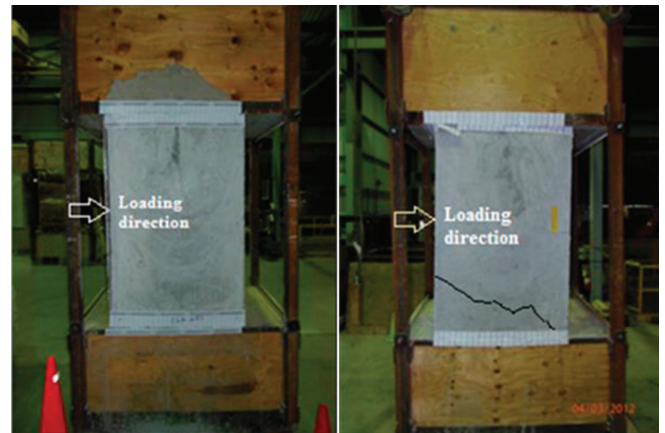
Typical failure modes for cement foam seal tests. With non-hitched seals (left), shear failure occurred first along the cement foam/concrete roof block interface and then along the cement foam/concrete floor block interface. With hitched seals (right), shear failure occurred first along the cement foam/concrete roof block interface and then through the cement foam material near the concrete floor block.
